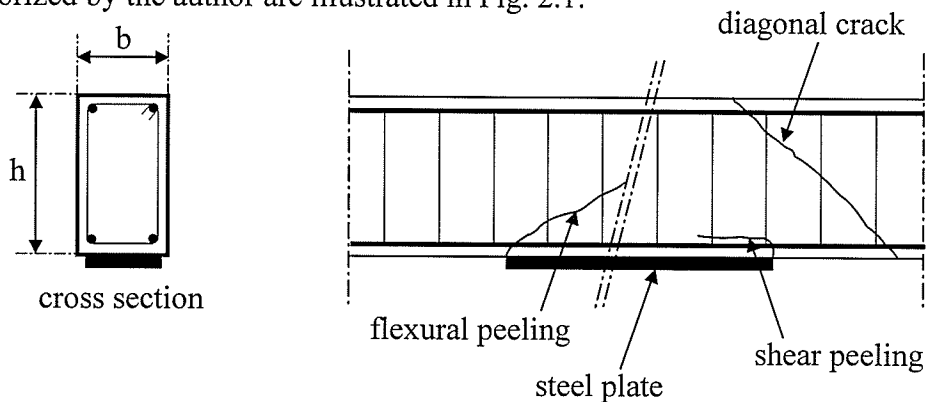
Failure modes in steel-plated reinforced concrete beams [Oehlers, 1988]
